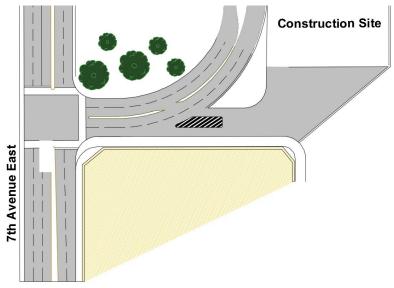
Transporting a Hydraulic Excavator Scenario
